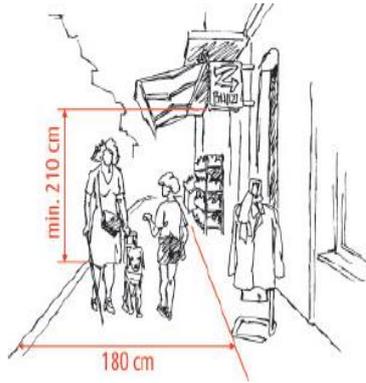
Pavement Widths and Hung Obstacles Dimensions.
